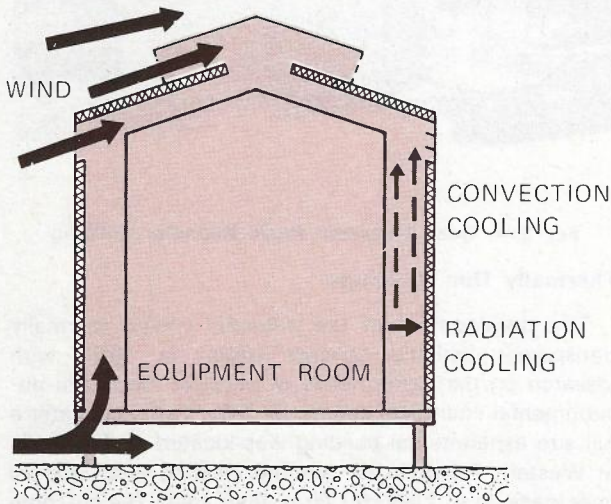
Cross Section Through Typical Naturally Cooled Thermally Transparent Shelter
